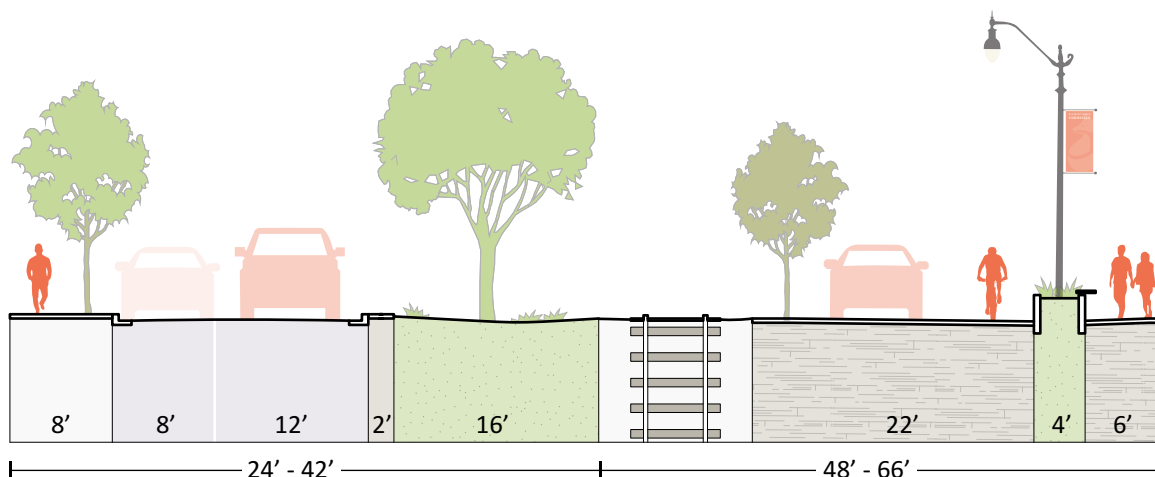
B (1). Hydraulic Street (Long-term).
